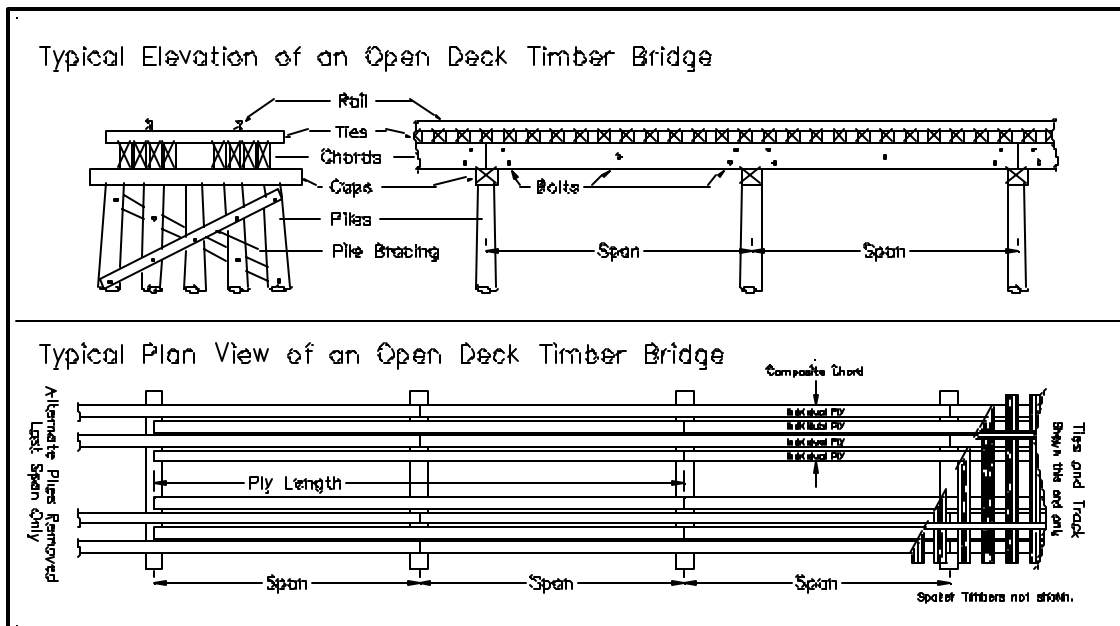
Typical elevation and plan views of open deck timber bridges showing major structural elements.
